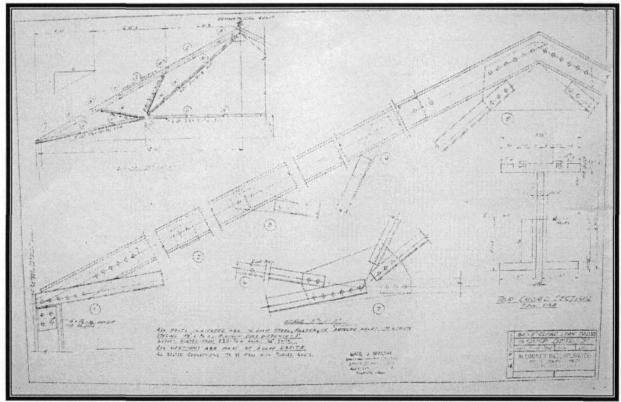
Structural details of roof trusses (Fort Detrick Archival Collection 1954).
